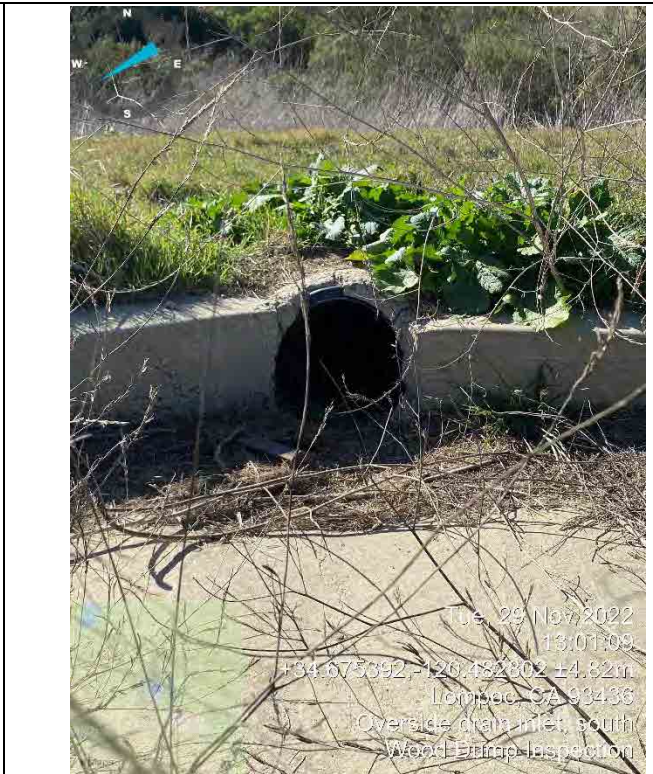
Southern Oversight Drain Inlet and Concrete Apron unobstructed and undamaged (facing southwest)
